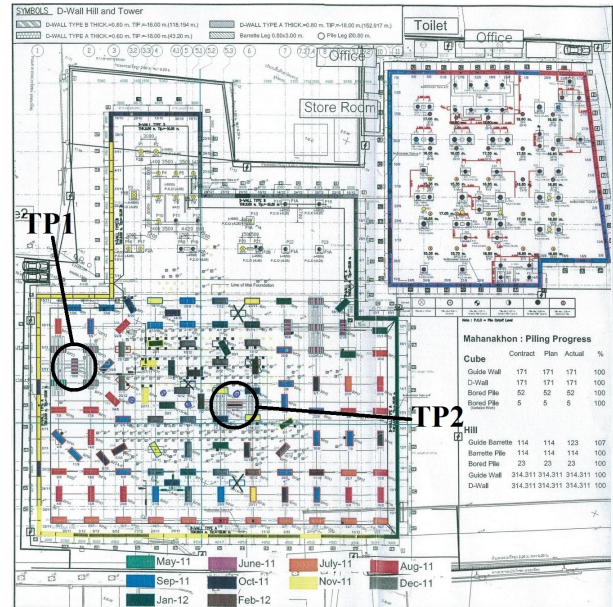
Location of barrette pile TP1 and TP2 in high-rise building project
